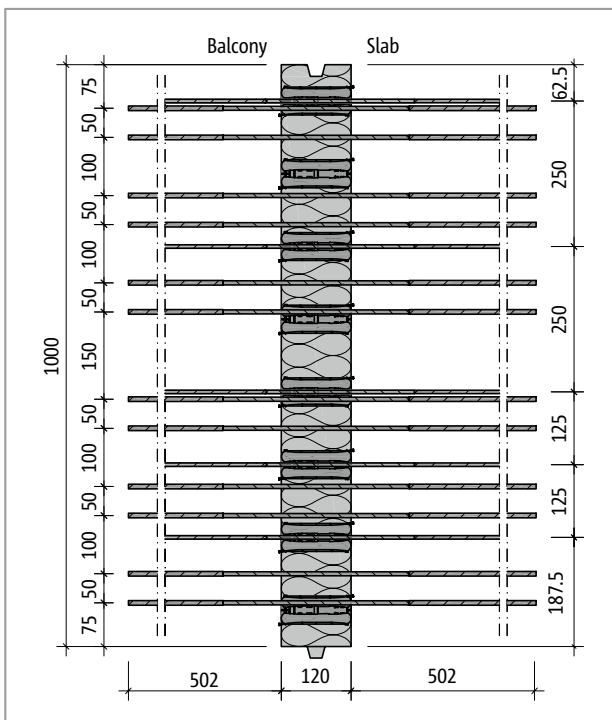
Schöck Isokorb® XT type K-M4: Product plan view
